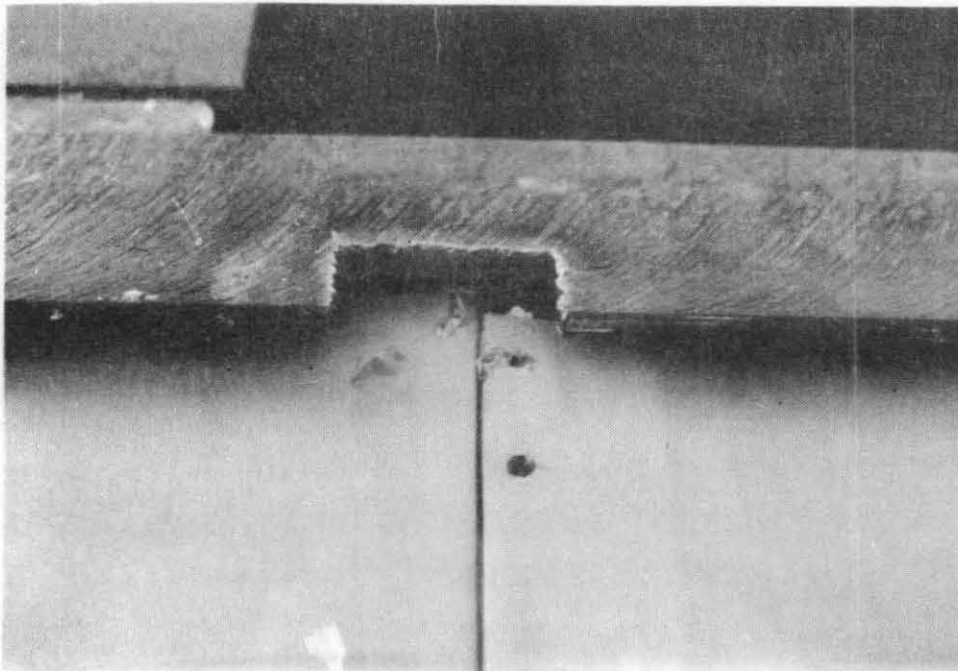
Partition Test Specimen P5: Typical Slippage Failure @ Vertical Joint
